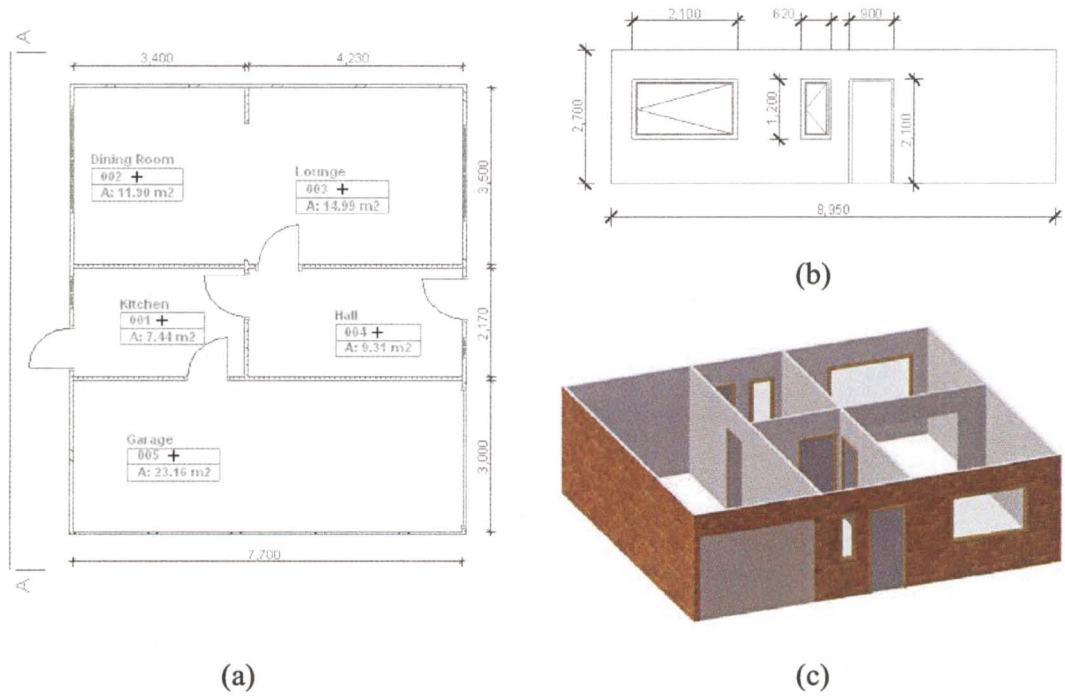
Ground floor of the two-storey residential building (a) plan elevation, (b) end elevation, section A-A, (c) isometric view.
